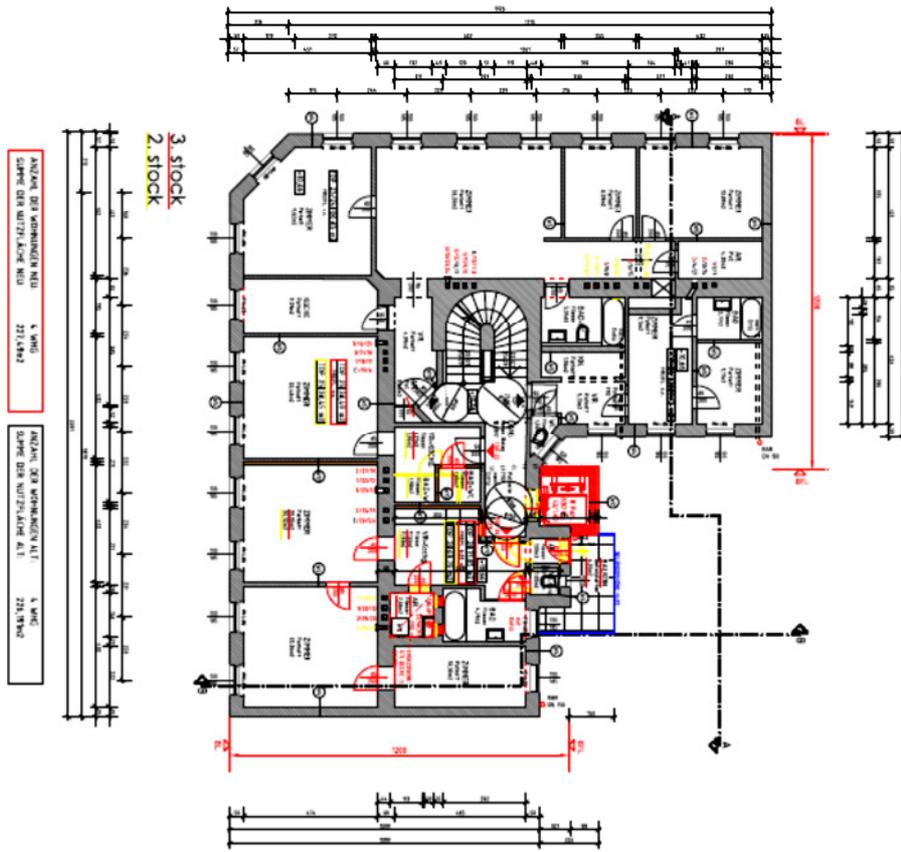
The plan of the structure at the 2<sup>nd</sup> and 3<sup>rd</sup> floors
